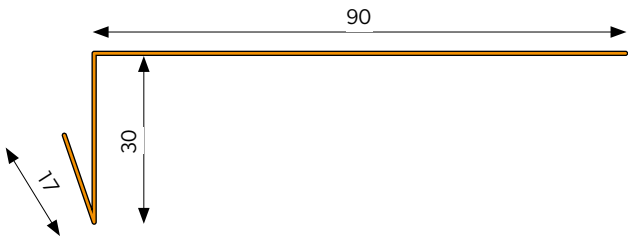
CONNECTION DETAIL WITH ANOTHER WALL
